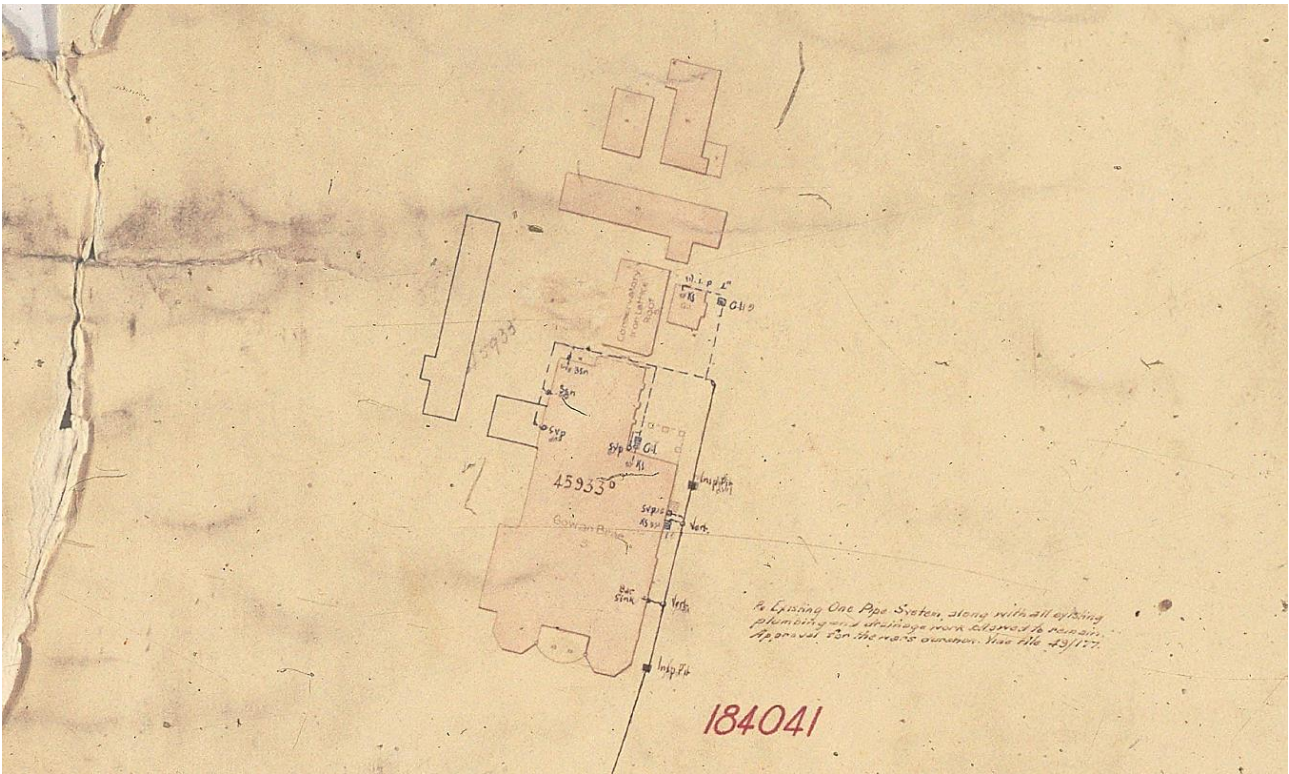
1944 detail sheet indicating form of the structures erected to north of Gowan Brae House.
